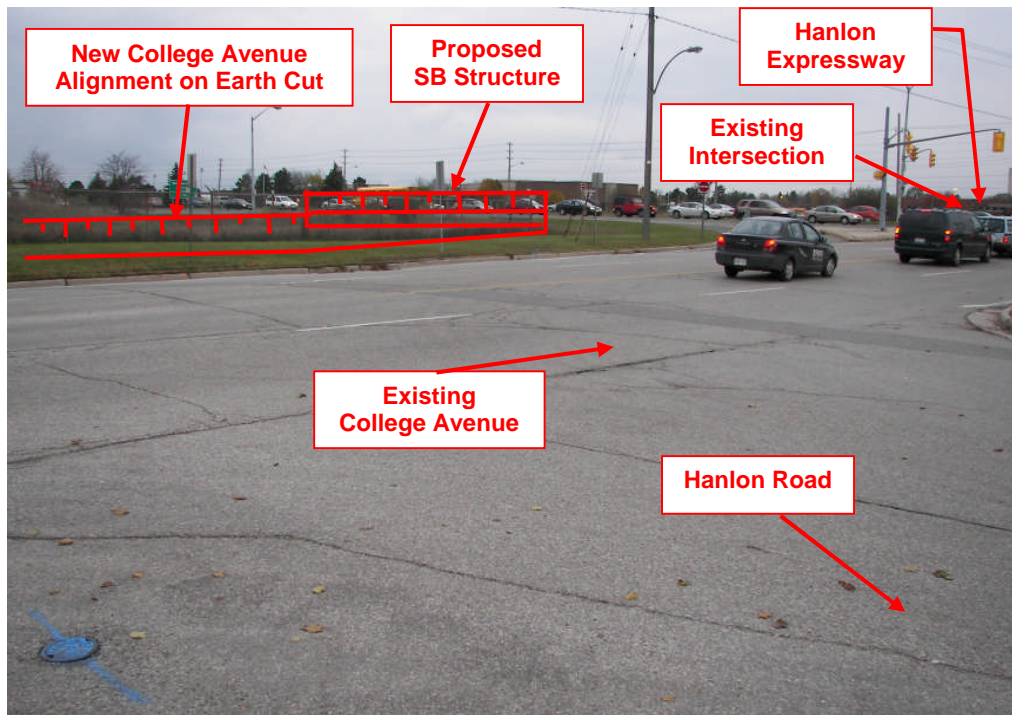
Viewing east from approximately 100 m east of Highway 6 (Hanlon Expressway) centreline median and 70 m north of College Avenue along new College Avenue alignment. (Nov. 15, 2007)
